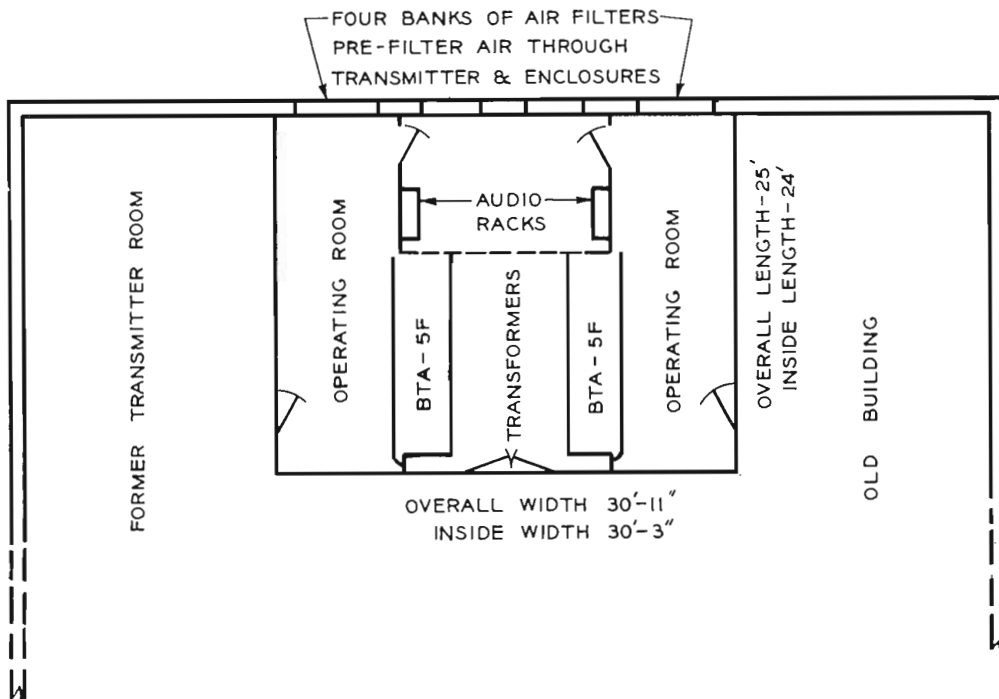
(above). Floor plan of the KXYZ layout in which the 5 KW transmitters of different stations are located.
